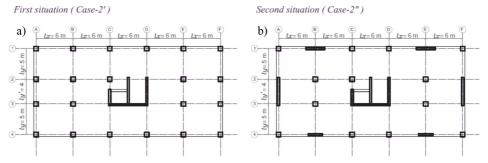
Ten story building (10SB). a) Structure without additional shear walls; b) Structure with additional shear walls
